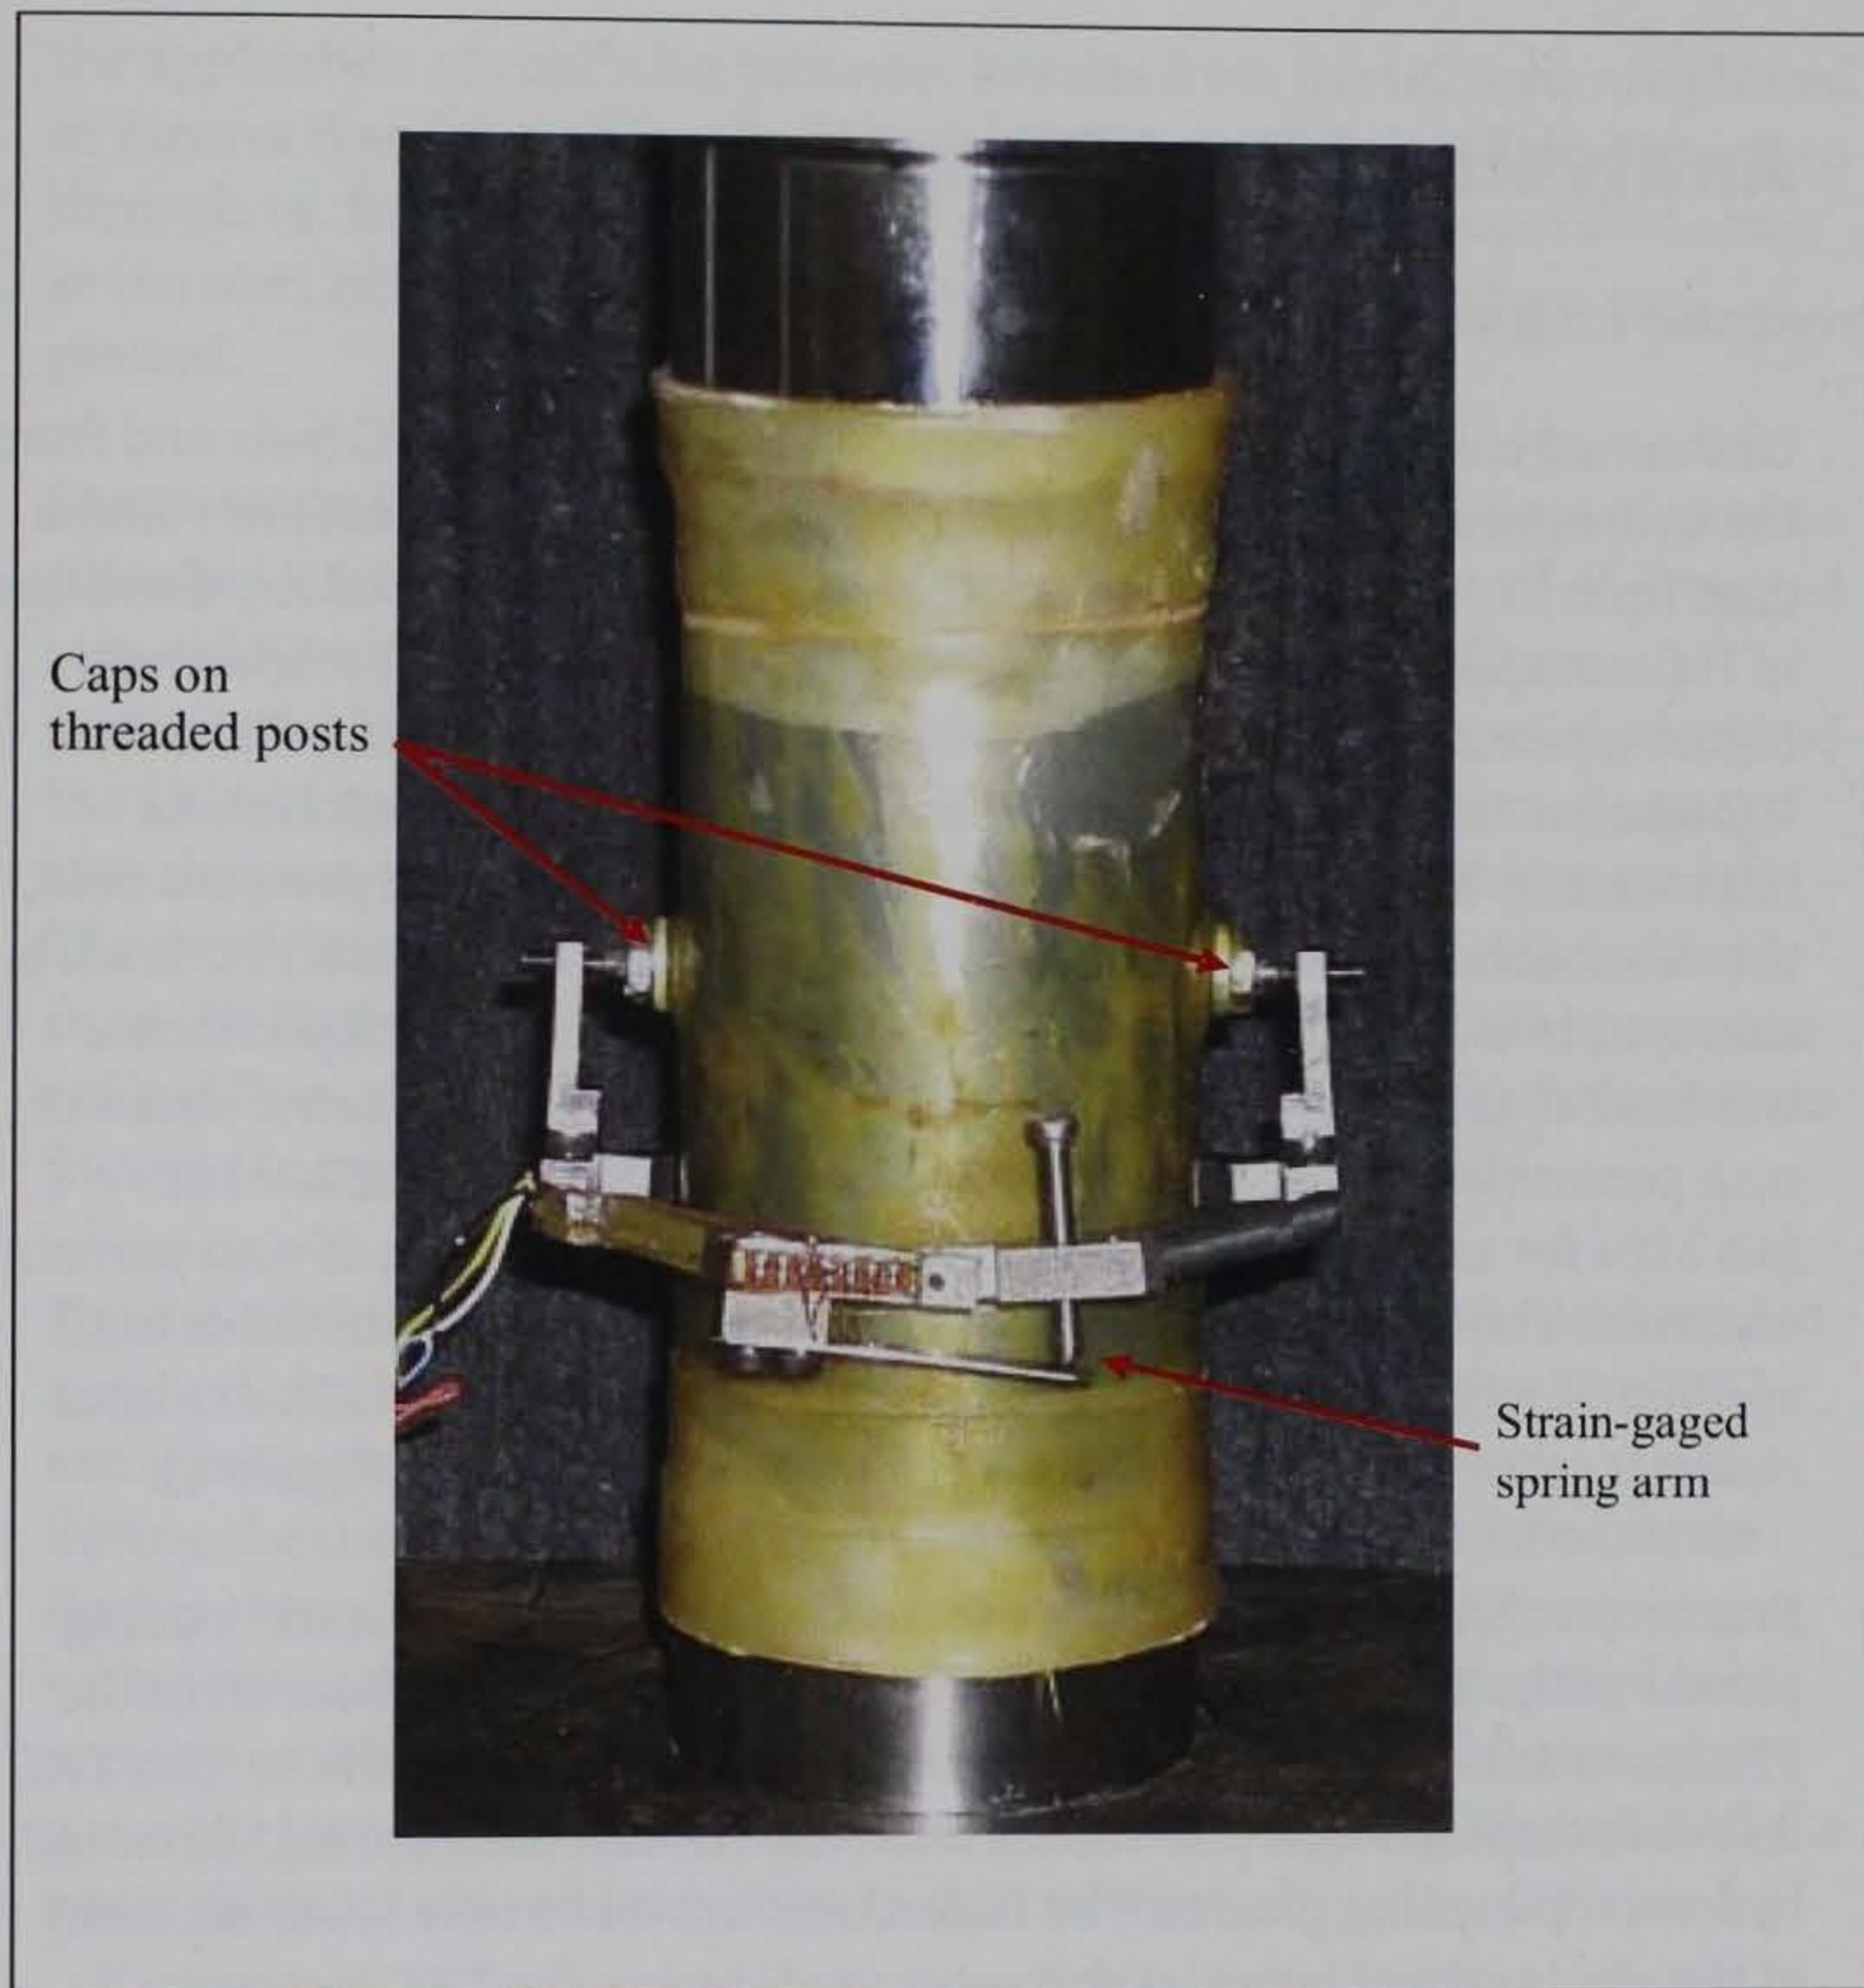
Spring-arm lateral deformer mounted on test specimen.
